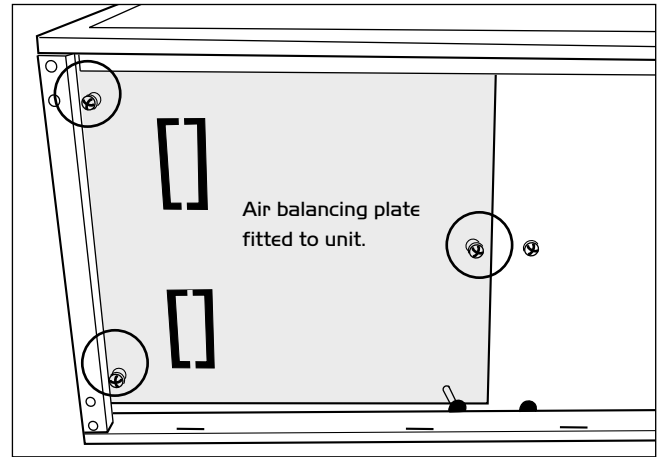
Adjust the damper blades on the air balancing plate to achieve the required air flow duties.
